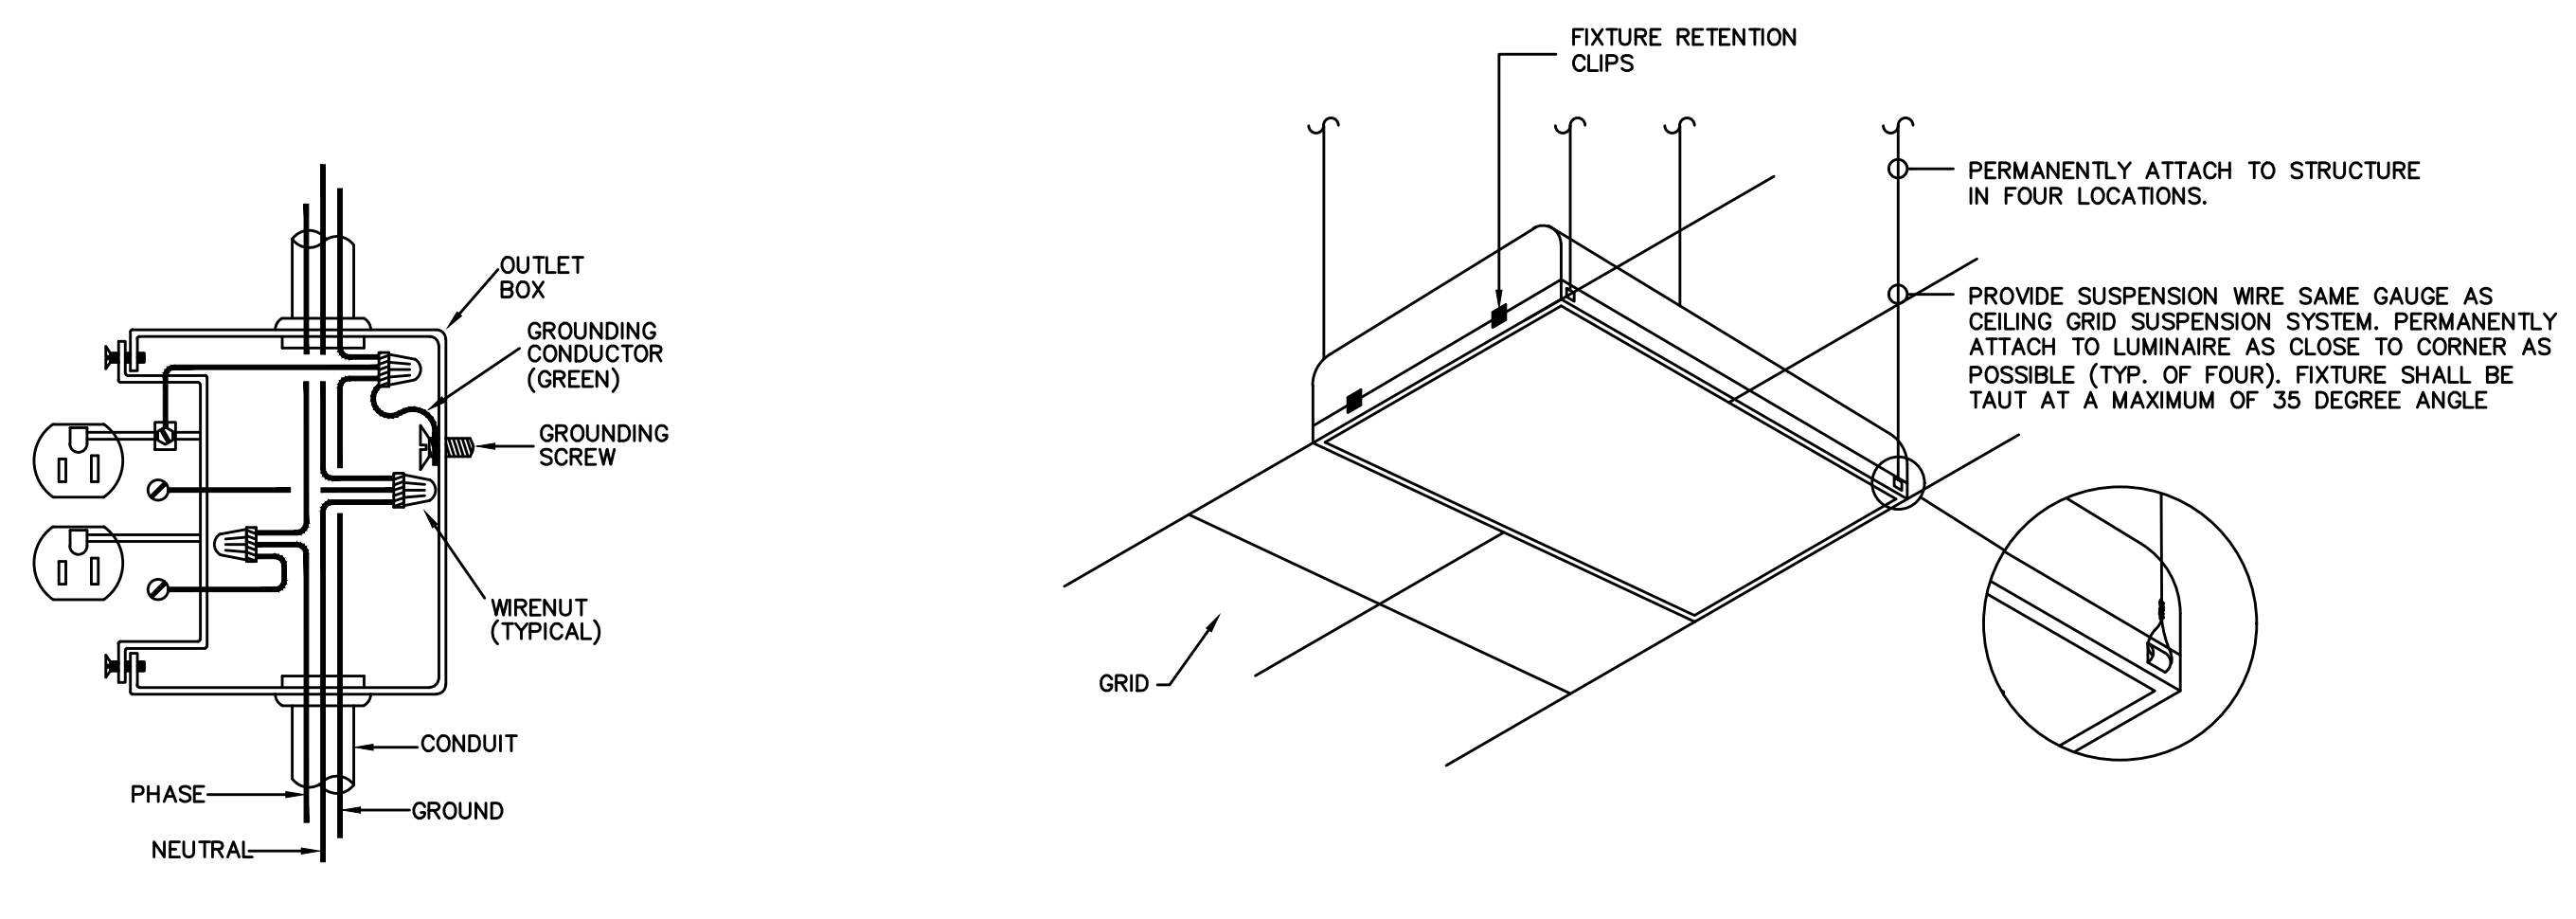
DETAIL: SURFACE MOUNTED RECEPTACLES AND LAN OUTLETS
